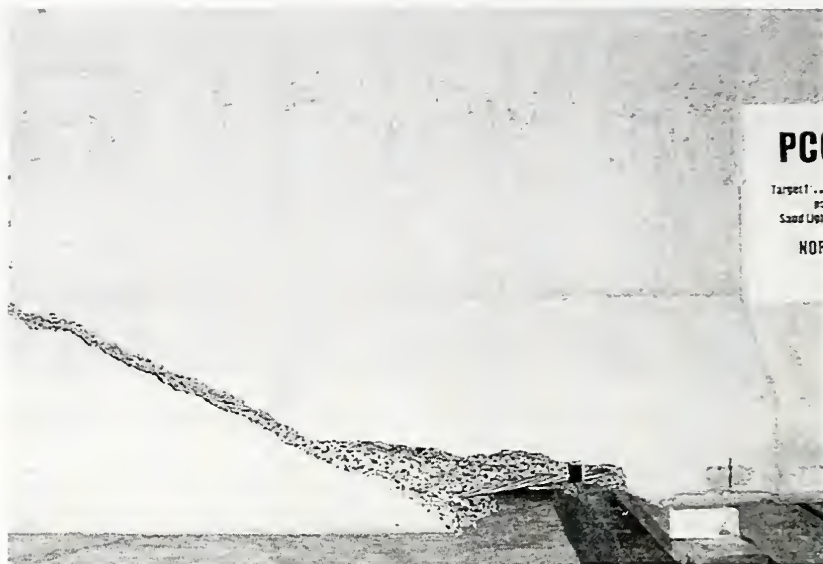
Failure Crack Extending to Face of Support, Specimen PC6N
